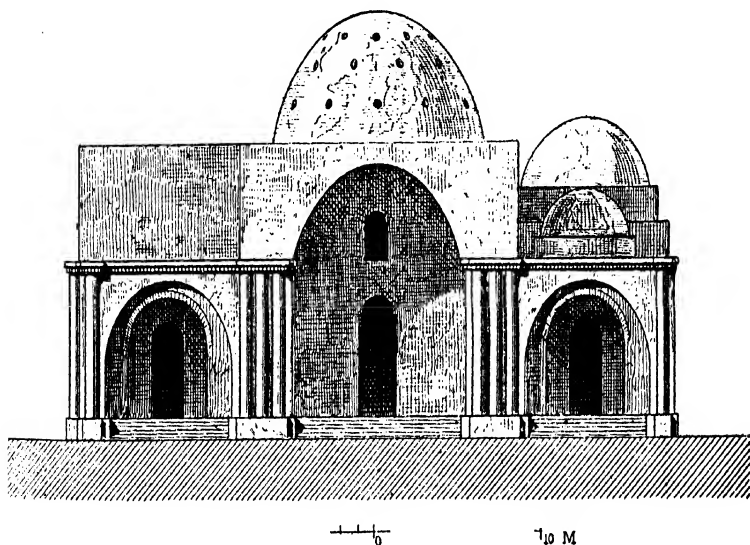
Palace at Sarvestan, Principal Façade. (F.C.) (P. & C.) Example of Domed and Vaulted Structure.
